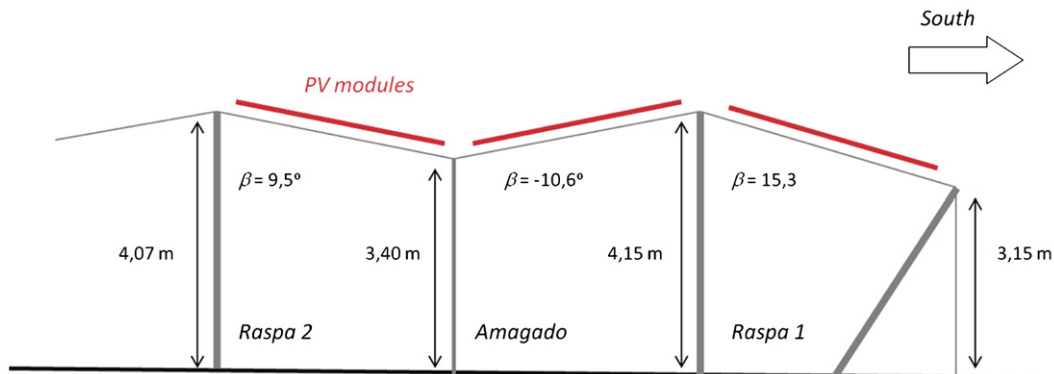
Tilting angles of greenhouse roof and PV modules.
